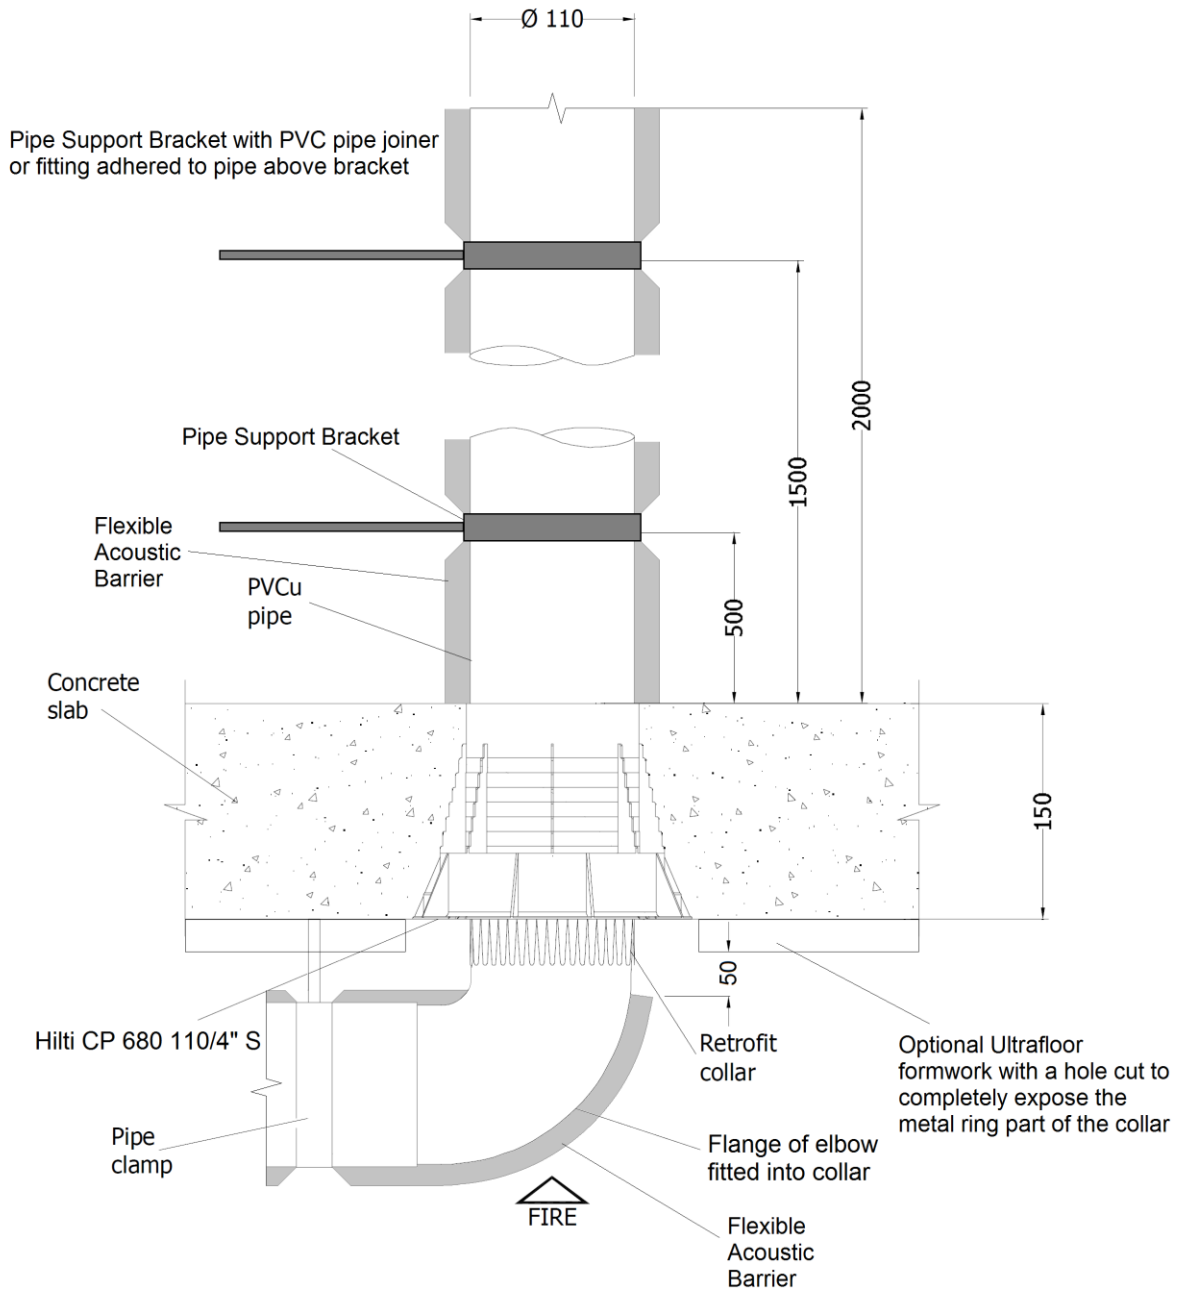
uPVC pipes flange of elbow fitted into firestop collar protected with Hilti CP 680 110/4" S + CP 680 N-RAD Cast-In Firestop Collar System with Ultrafloor, optional flexible acoustic barrier at least 50mm from underside of Ultrafloor
